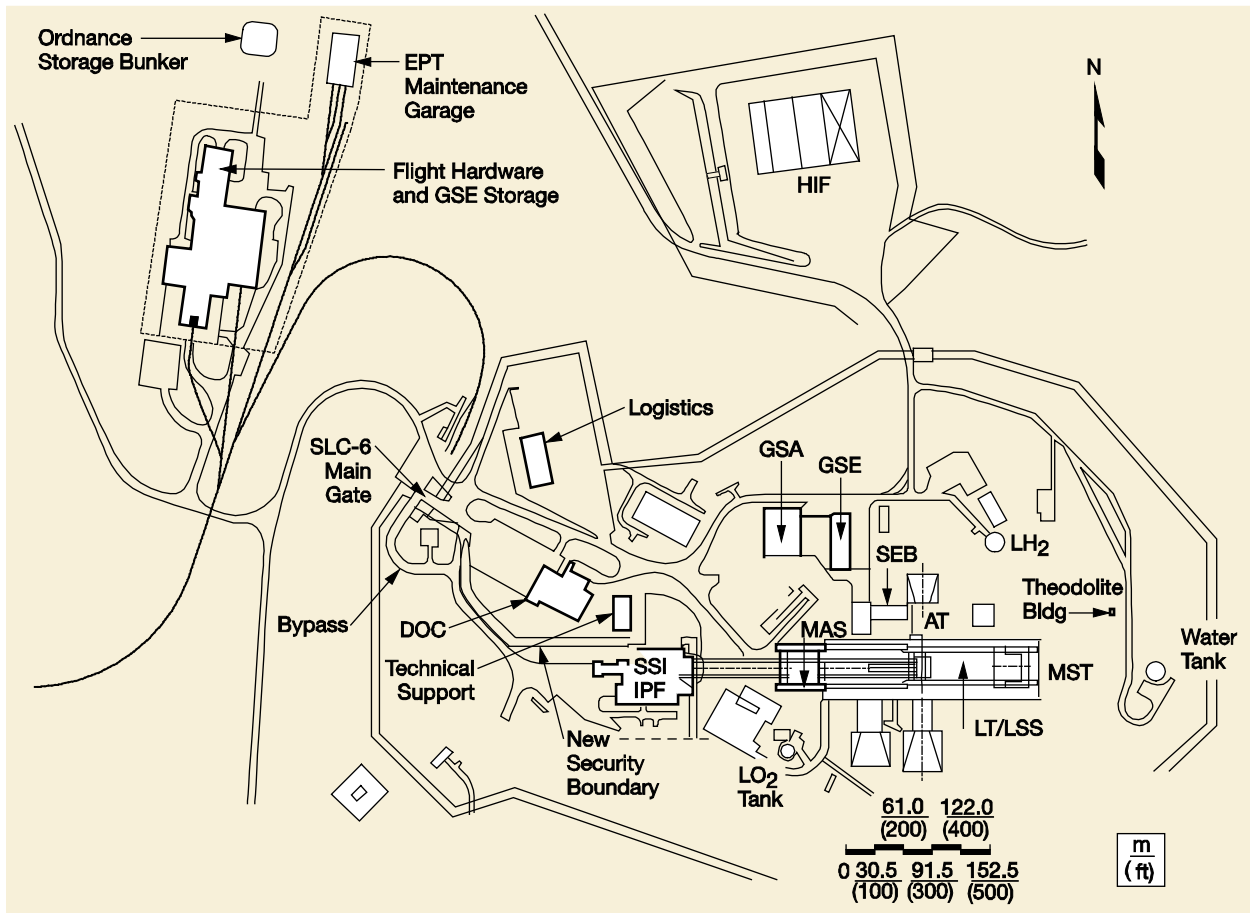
Space Launch Complex 6, VAFB Site Plan
